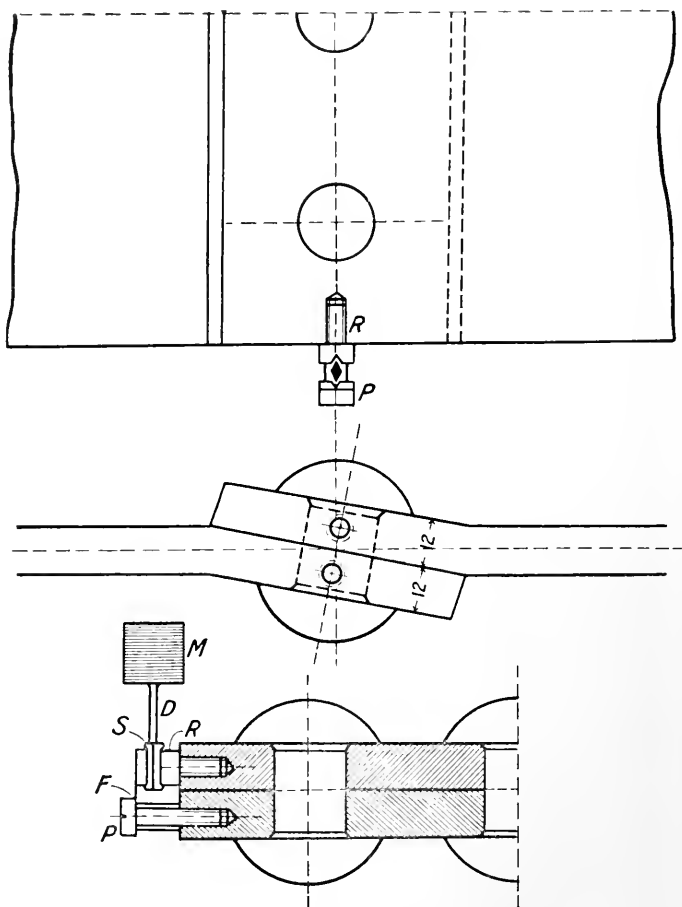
No. 1 Apparatus for Measuring the Slip of Riveted Joints.
